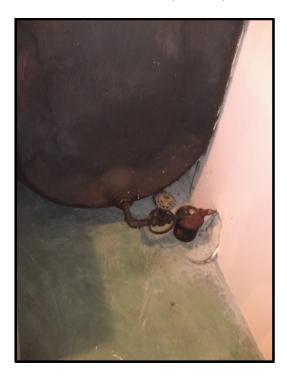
Photograph illustrates copper oil line at 534 Edison Avenue, exiting the concrete floor slab in the vicinity of the furnace.
